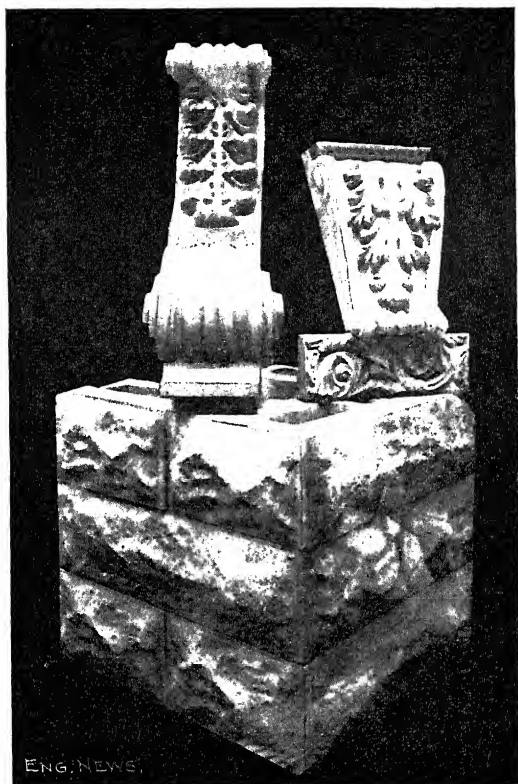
PLATE XV. Concrete Blocks Cast in Sand at Havana.
